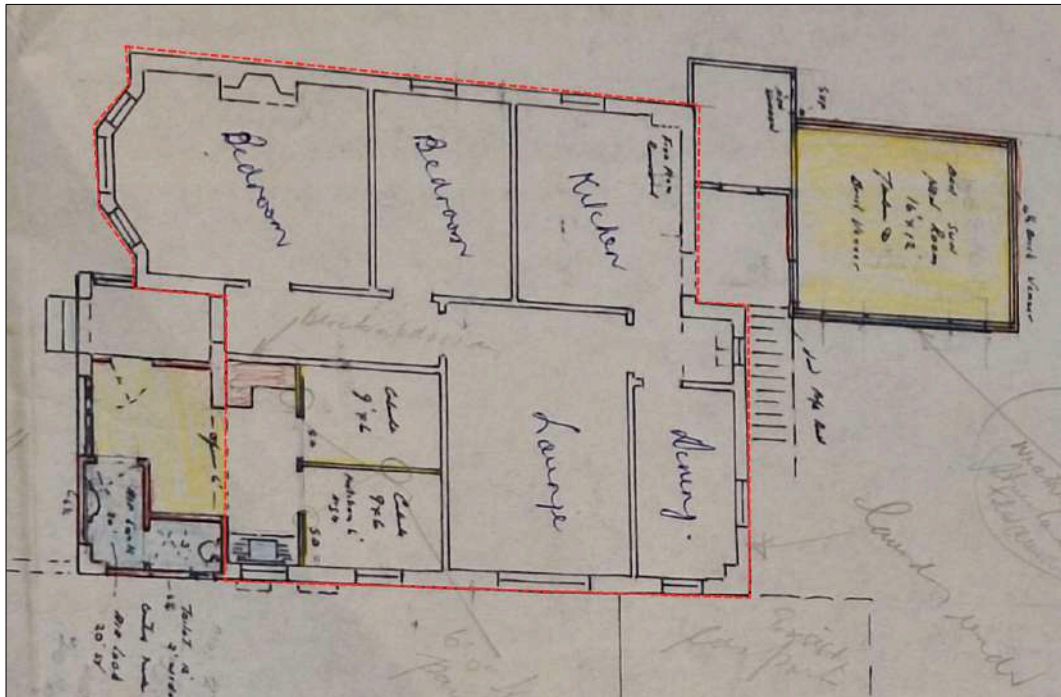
The proposed works from DA1967/207. Part of the original, single storey floorplan (outlined in red) can be understood in these plans, contrasting with the three-storey dwelling that exists at No. 31 Dover Road, Rose Bay today. DA1967/207.
